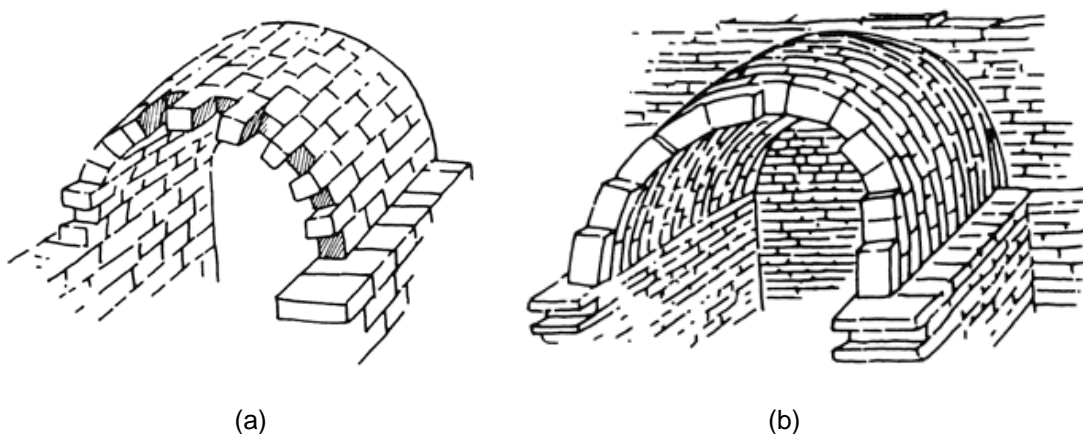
True arch construction, construction of vaults (a) requiring temporary support; (b) using end walls and previous construction for stability during construction.
